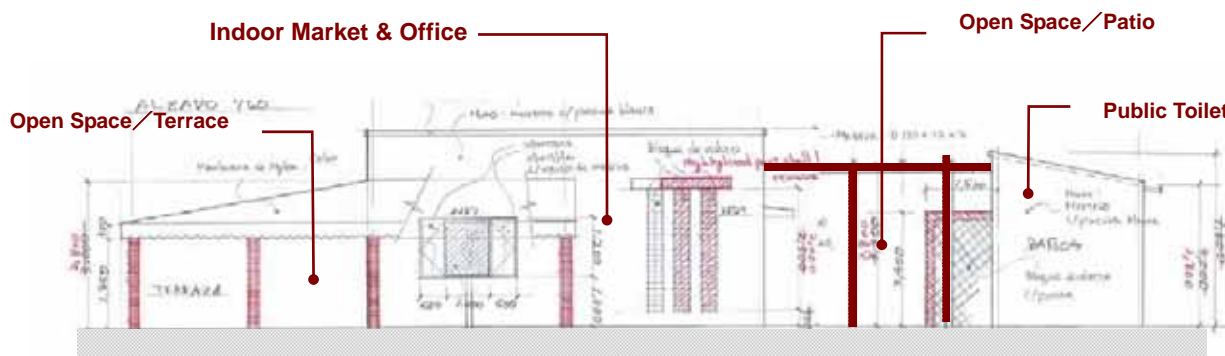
Elevation of the Facilities (drawn by the Study Team)
